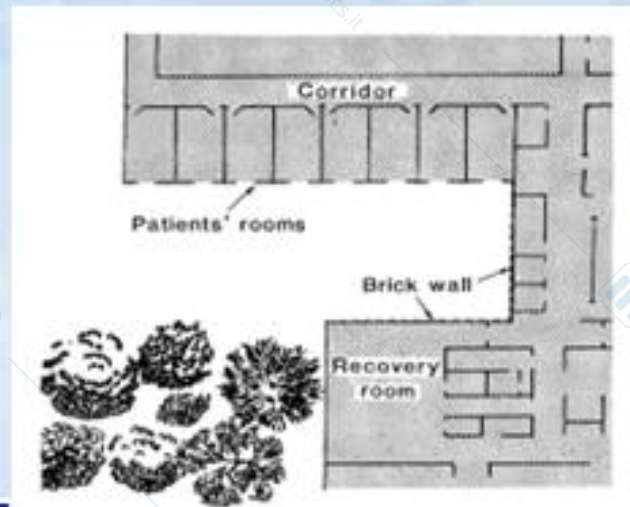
Plan of the second floor of the study hospital showing the trees versus wall window views of patients. Data were also collected for patients assigned to third-floor rooms. One room on each floor was excluded because portions of both the trees and wall were visible from the windows. Architectural dimensions are not precisely to scale.
